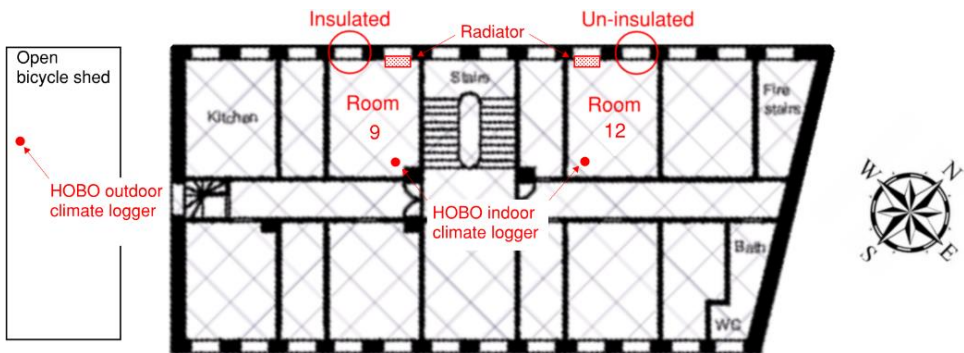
Floorplan of the 1st floor (2nd in American terms) in Borchs dormitory.
